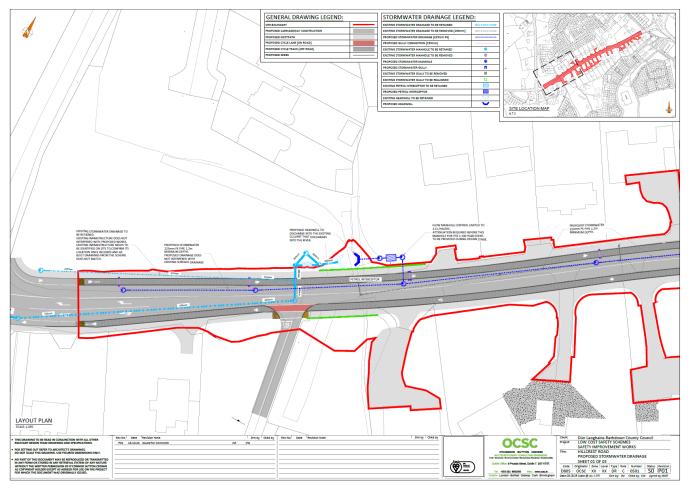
Hillcrest Road Proposed Stormwater Drainage Section C-0501
